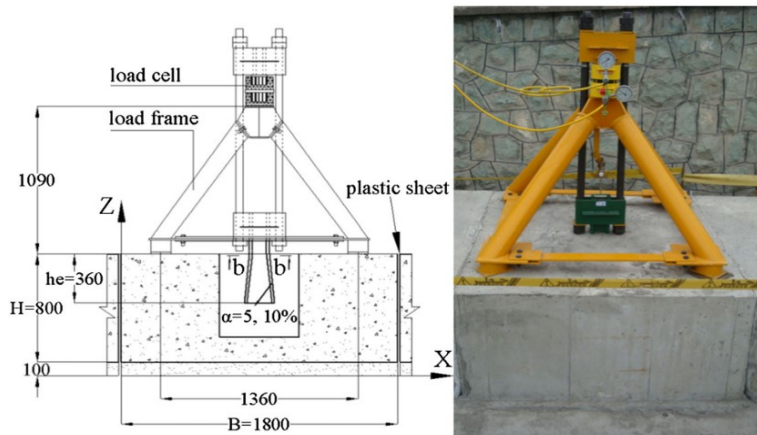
The Concrete block, the load frame and a specimen (mm), Heristchian et al. (2014) [7]
